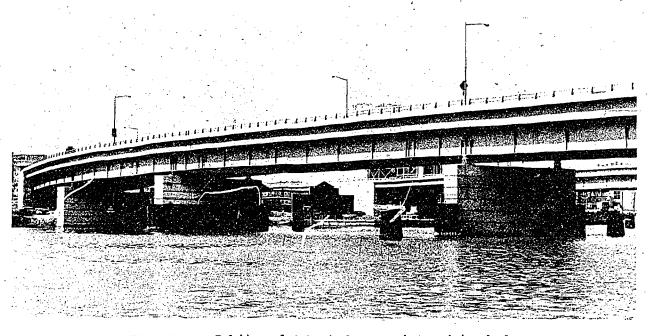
Dolphins and timber fenders around piers of river bridge.
